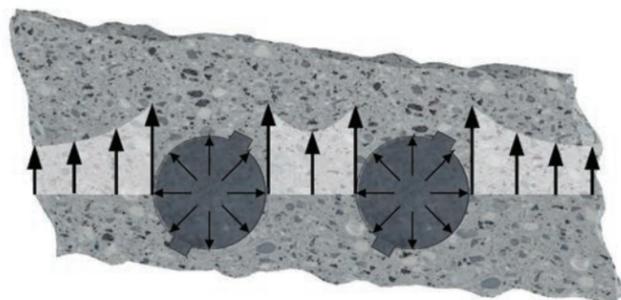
Radial forces on concrete and splitting stresses shown on section through the splice.
